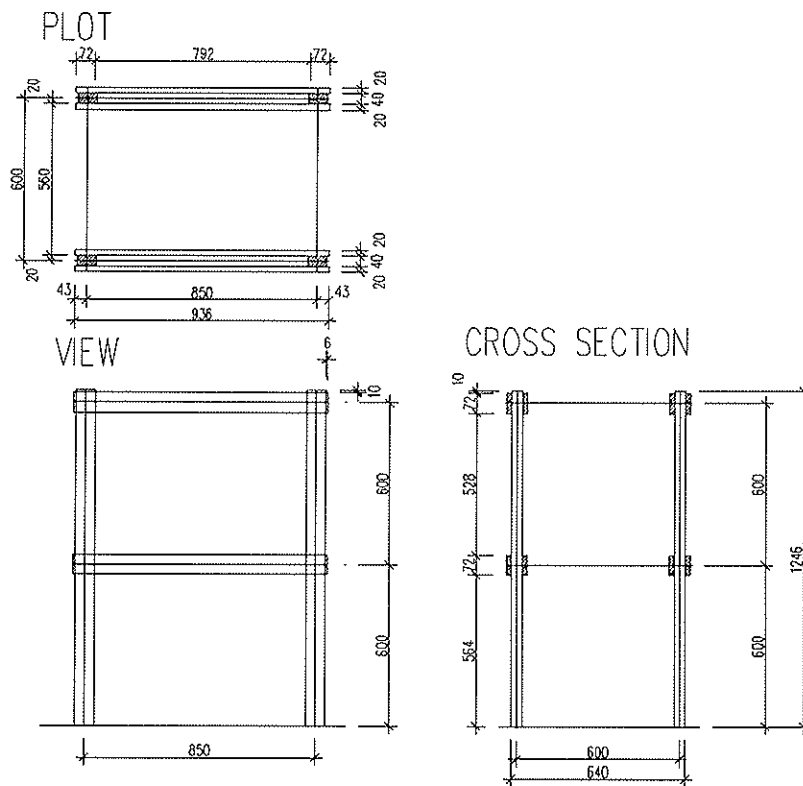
Dimensions of the 1:4 scaled frame (dimensions in mm).
